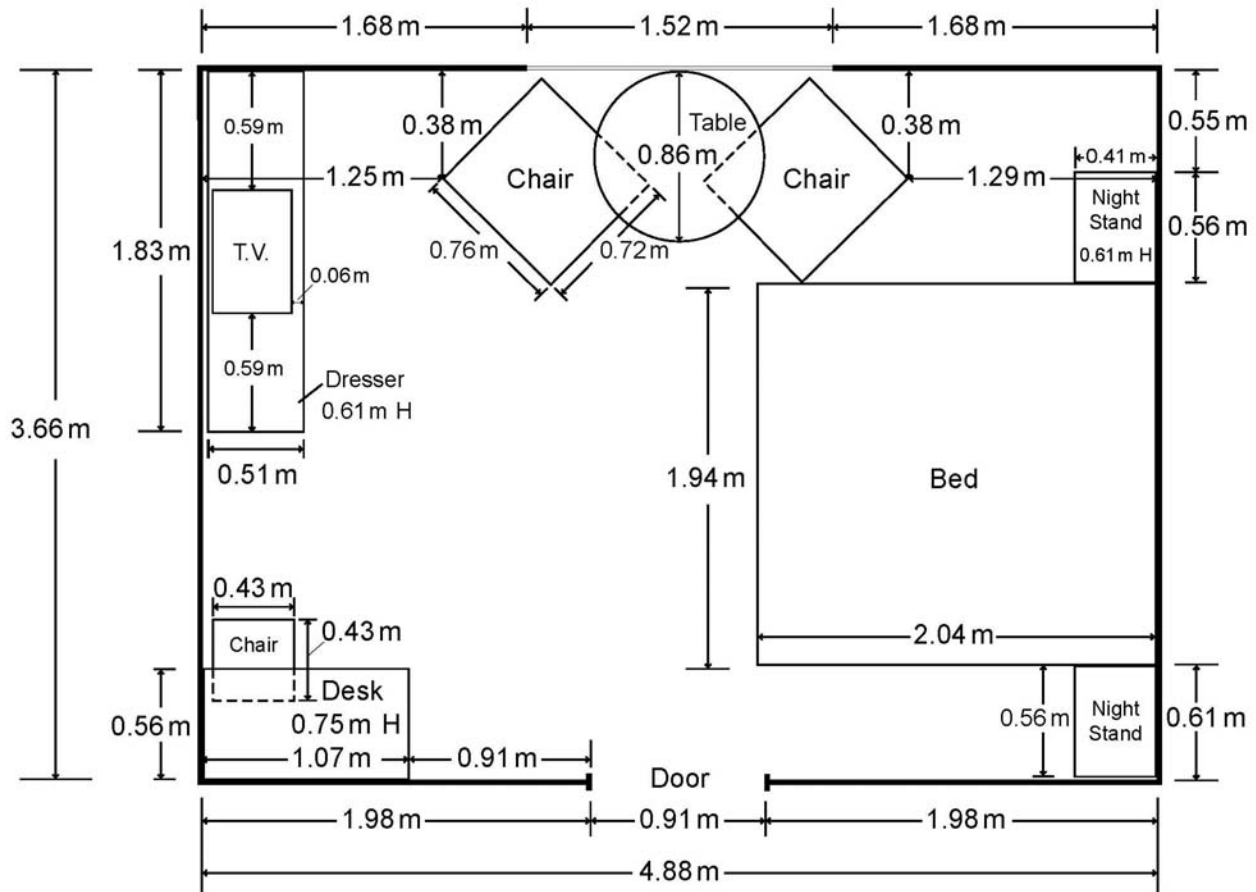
Schematic floor plan of bedroom with furniture locations.
